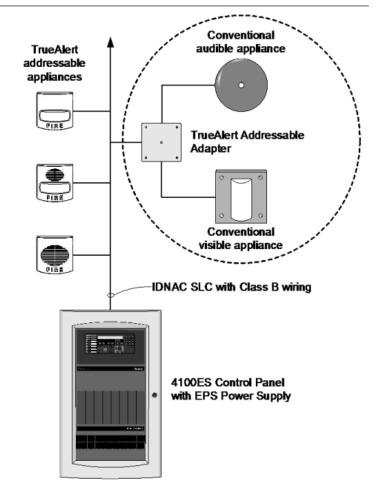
TrueAlert Addressable Adapter Module, Typical One-Line Wiring Reference
